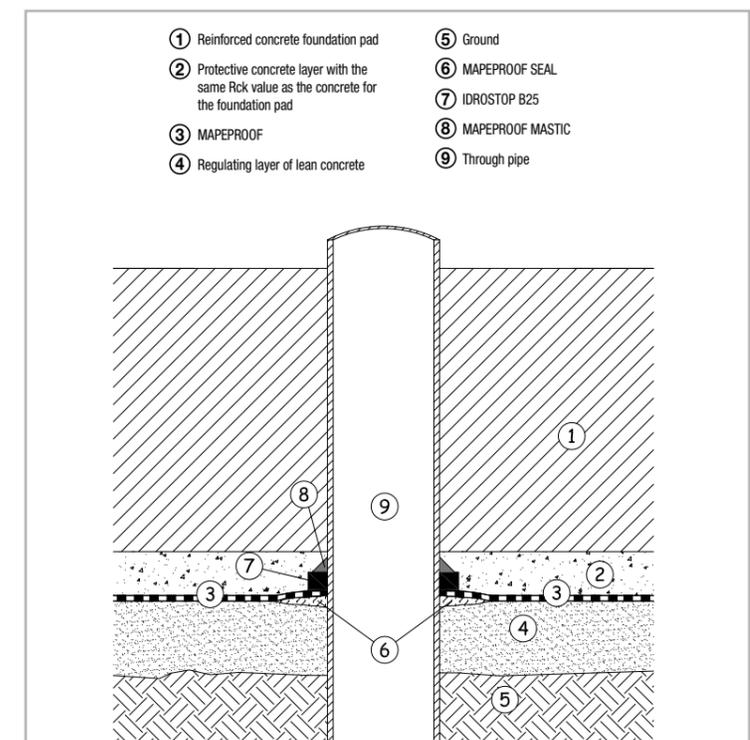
Detailed layout of sealing a pipe which passes through a foundation pad
